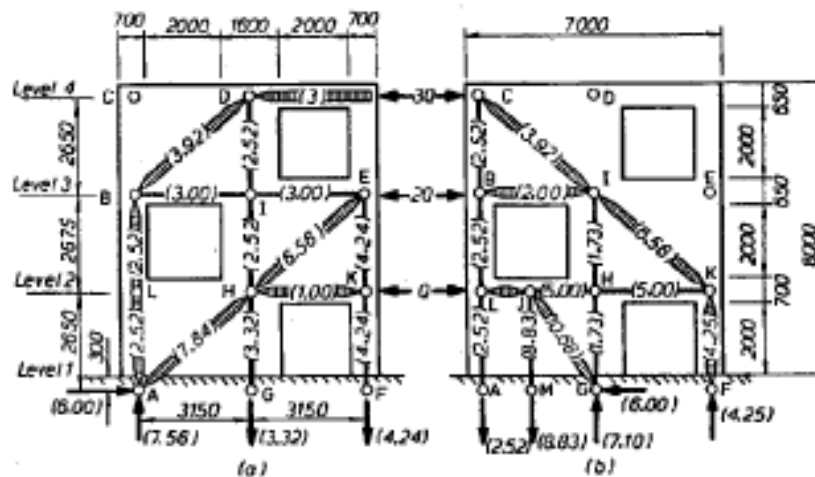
Strut and tie models for a squat wall with openings (source: Paulay and Priestley, 1992)
